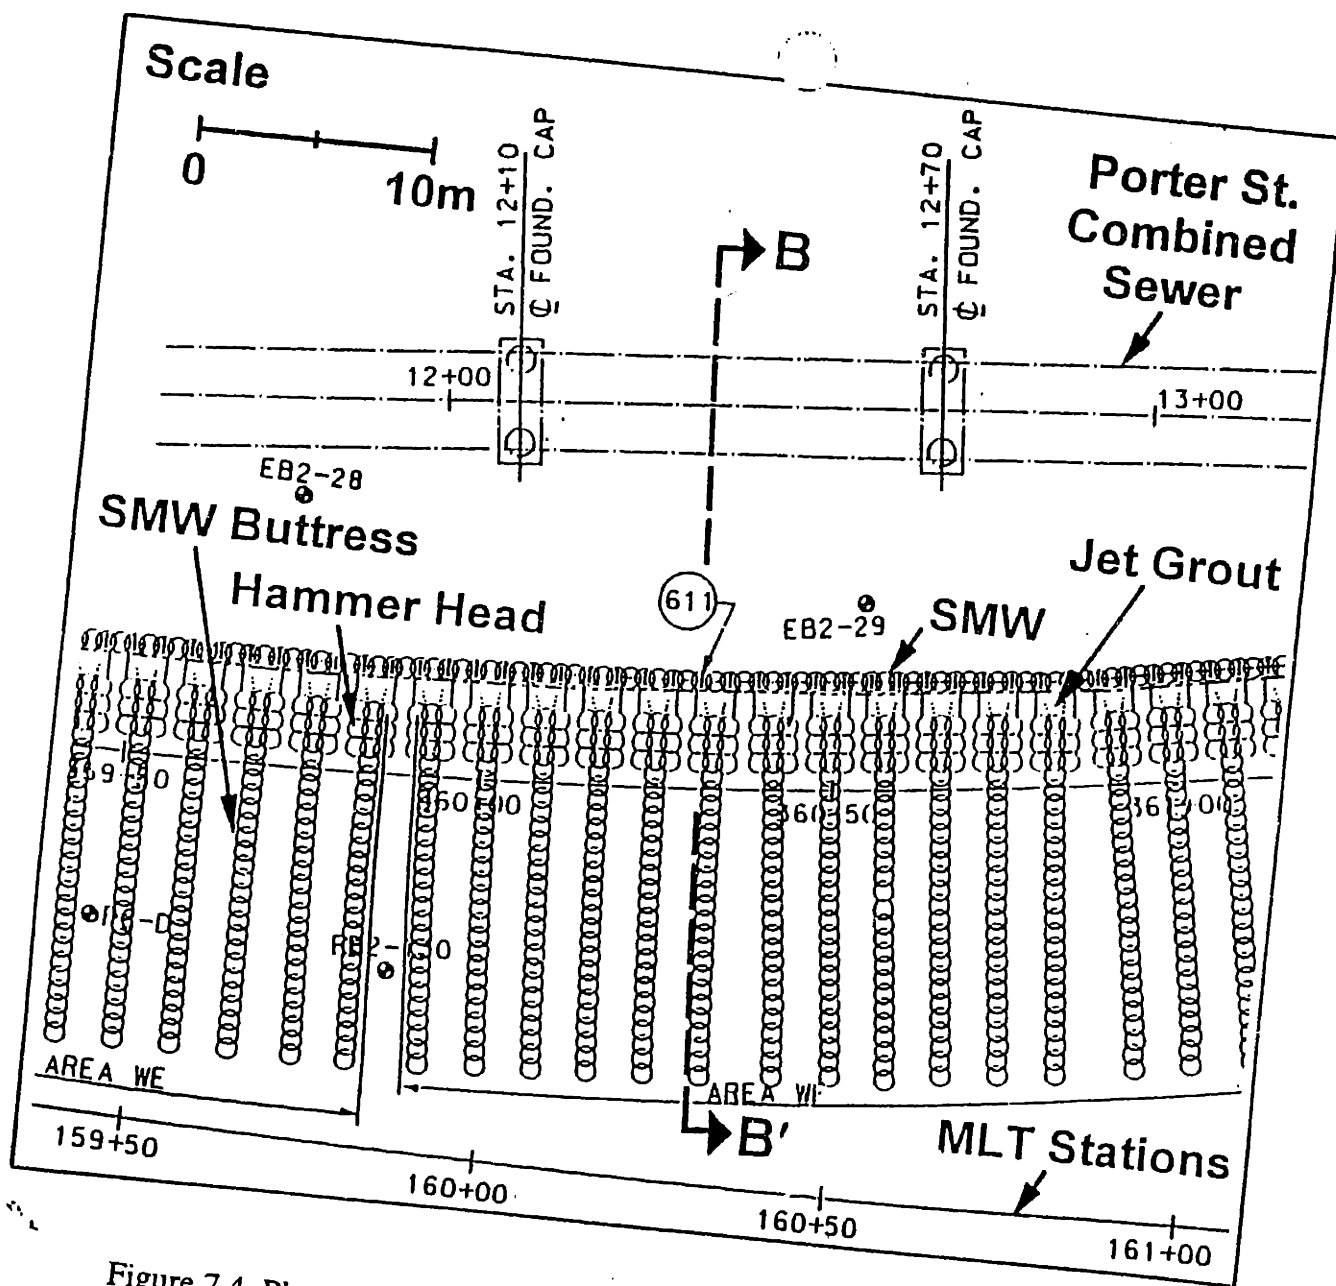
Plan view of basal stabilization scheme at West wall, Section B-B' (after O'Rourke and O'Donnell, 1997b)
